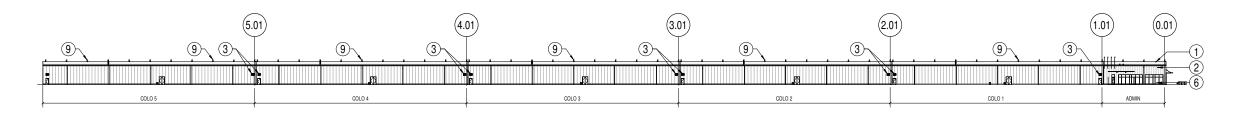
R Floor Plan South Building San José Data Center (SJC02) San José, California
